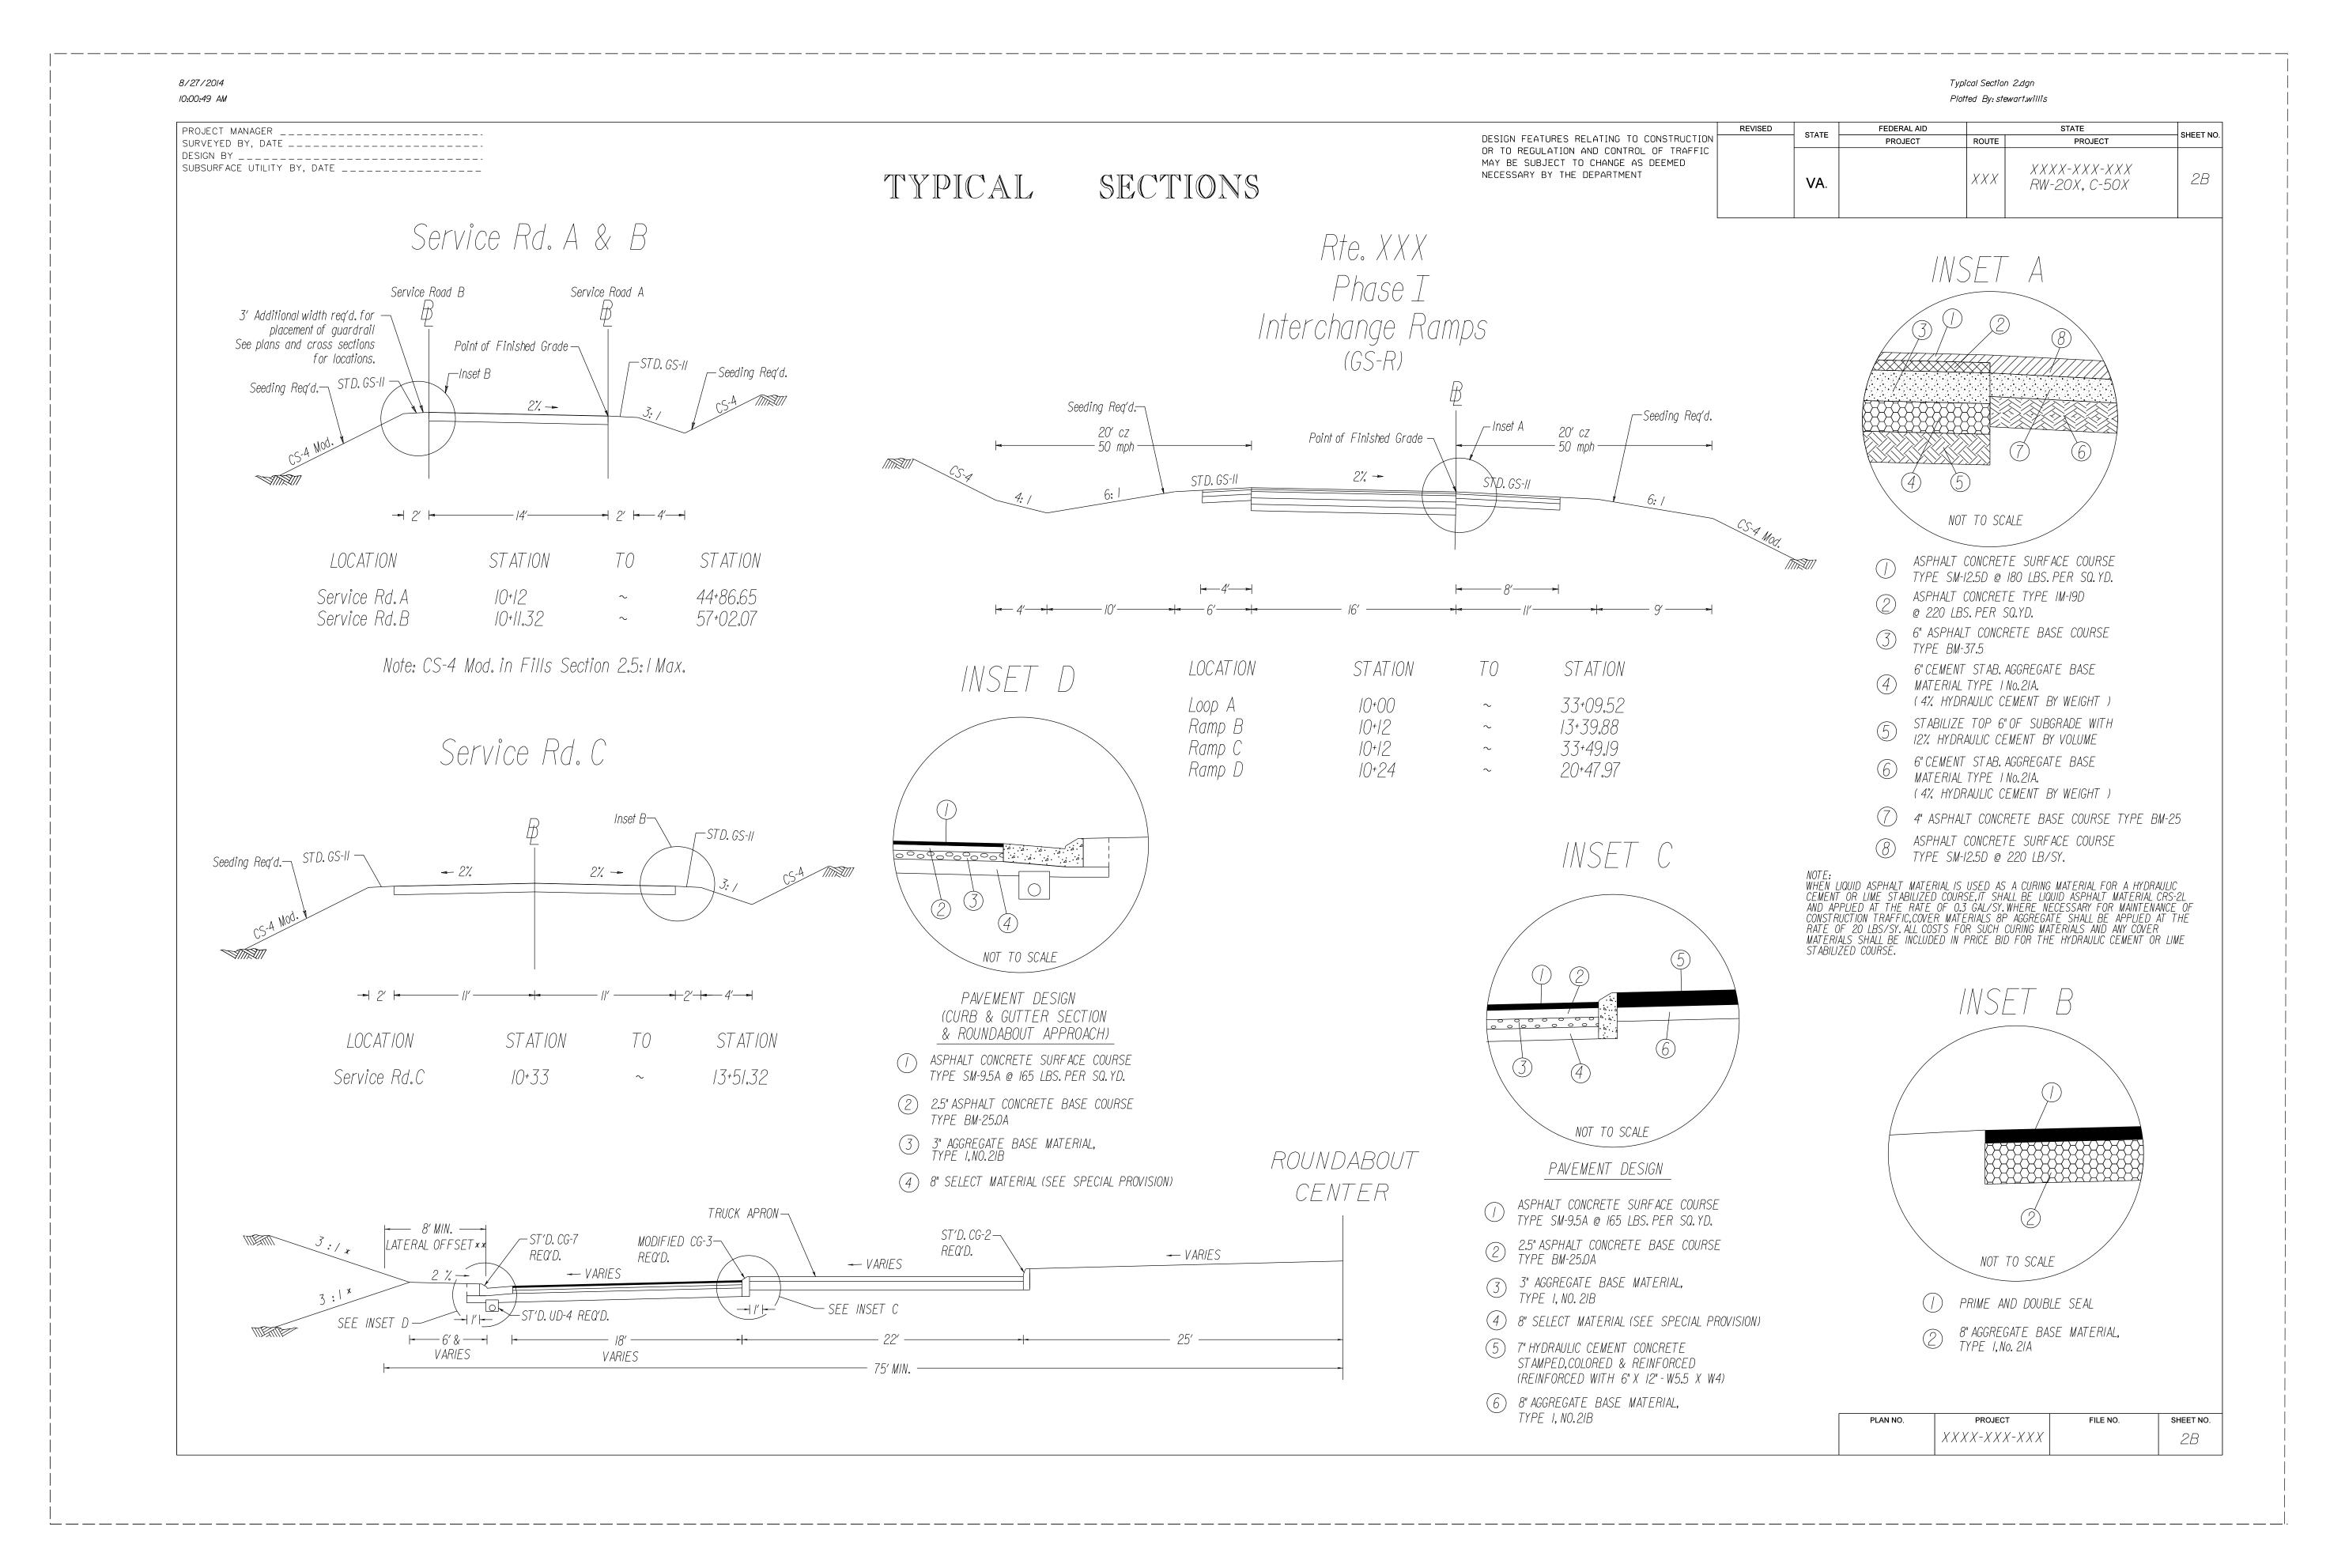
H - 17 SAMPLE TYPICAL SECTION SHEET
